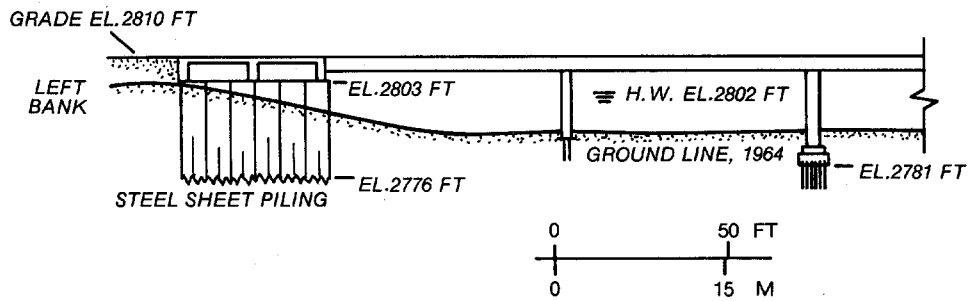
Elevation sketch of left abutment of US-83 bridge, showing steel sheet-pile bulkheads.
